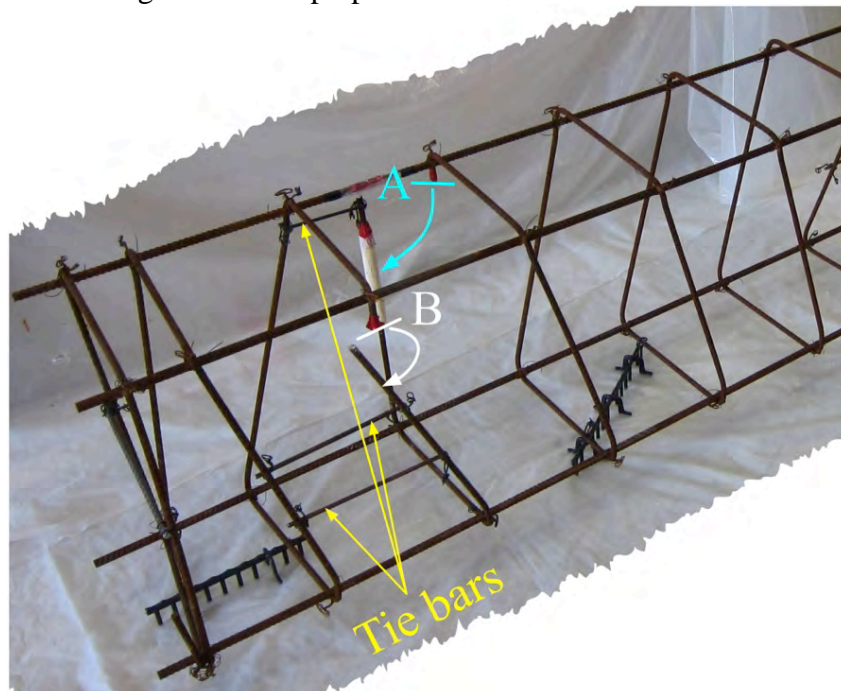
Details for splicing two continuous transverse reinforcement cages
